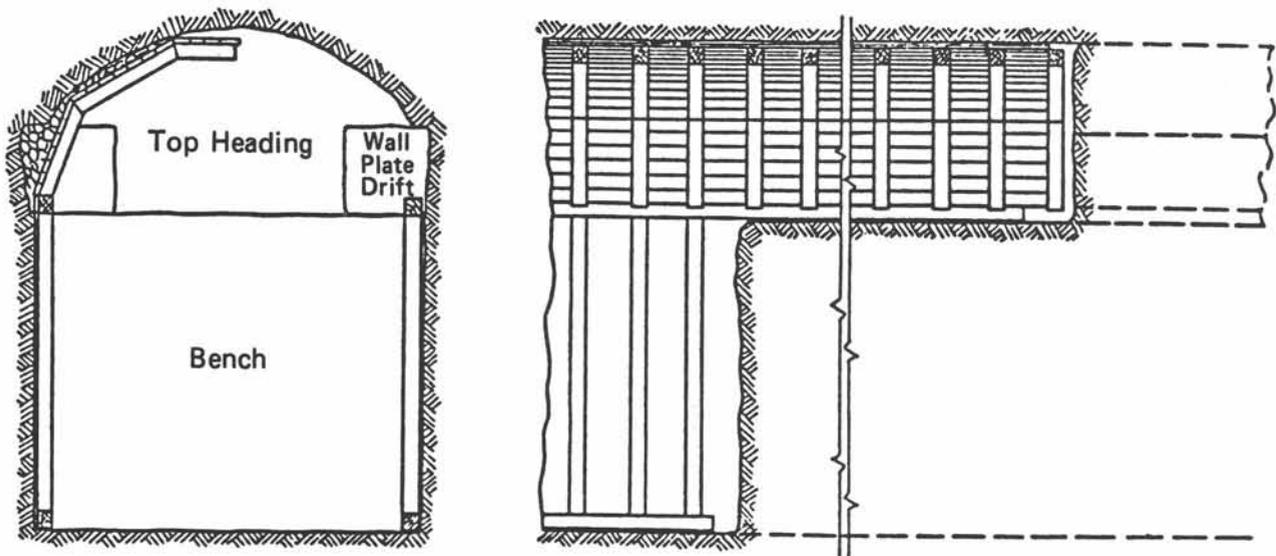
Excavation of wall plate drifts followed by top heading and bench. From Baxter (1932) by permission, American Society of Civil Engineers.
